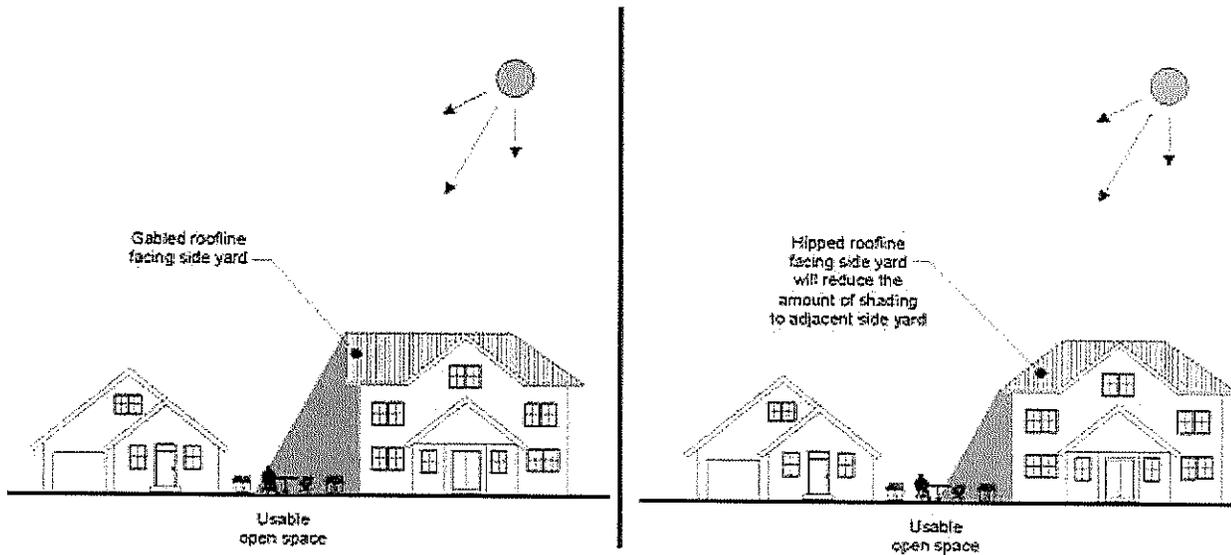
Encourage rooflines along the side yard that maximize solar access to adjacent homes and/or private open space.
